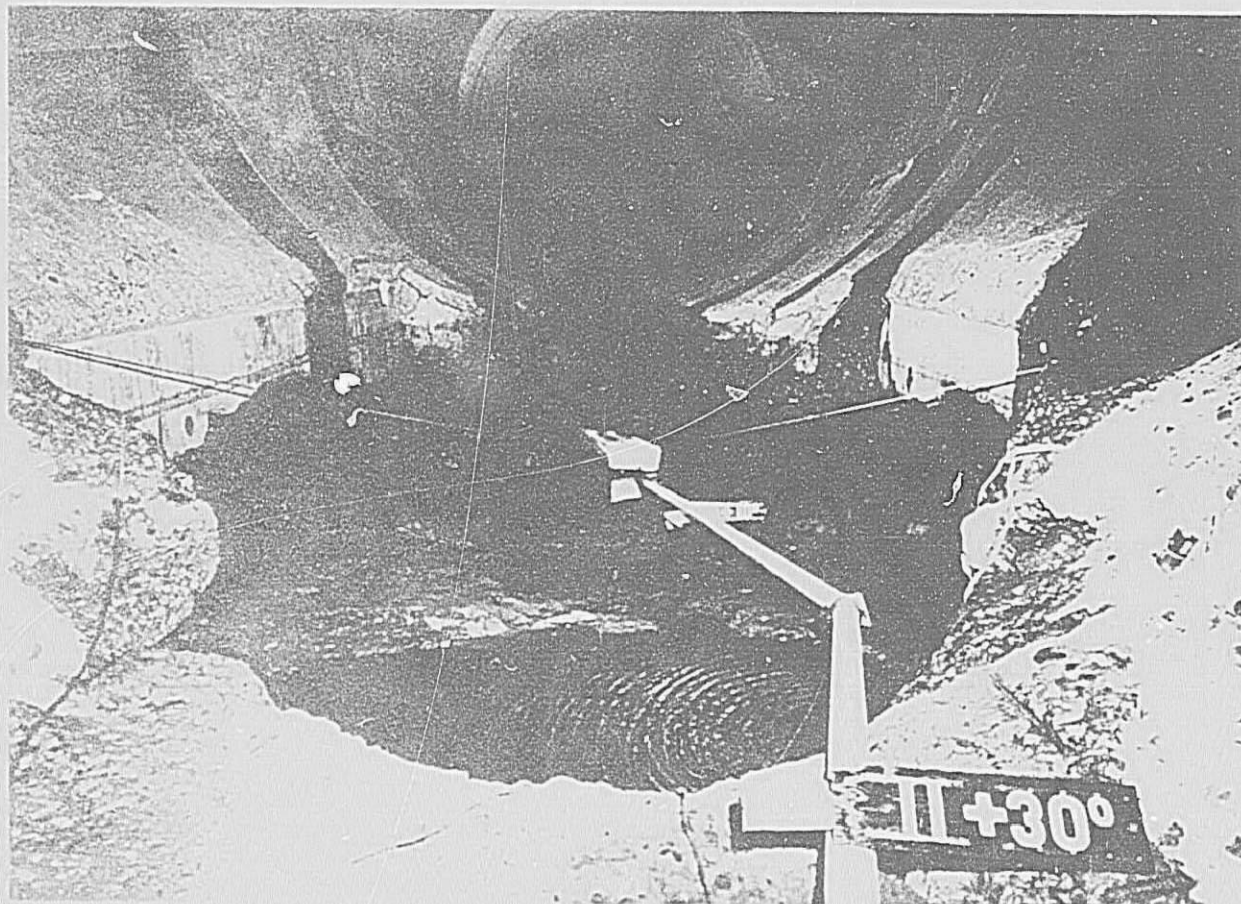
Major damaged area in horizontal reach of tunnel. Photo P459 640 4169
